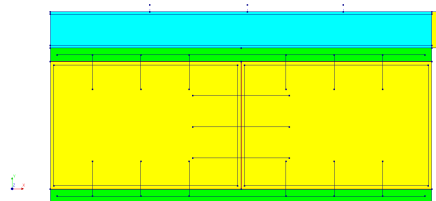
PST 1: Three vertical connection boxes and six grouted rebar at horizontal connections per LWFC panel (FE Model 25-06)
